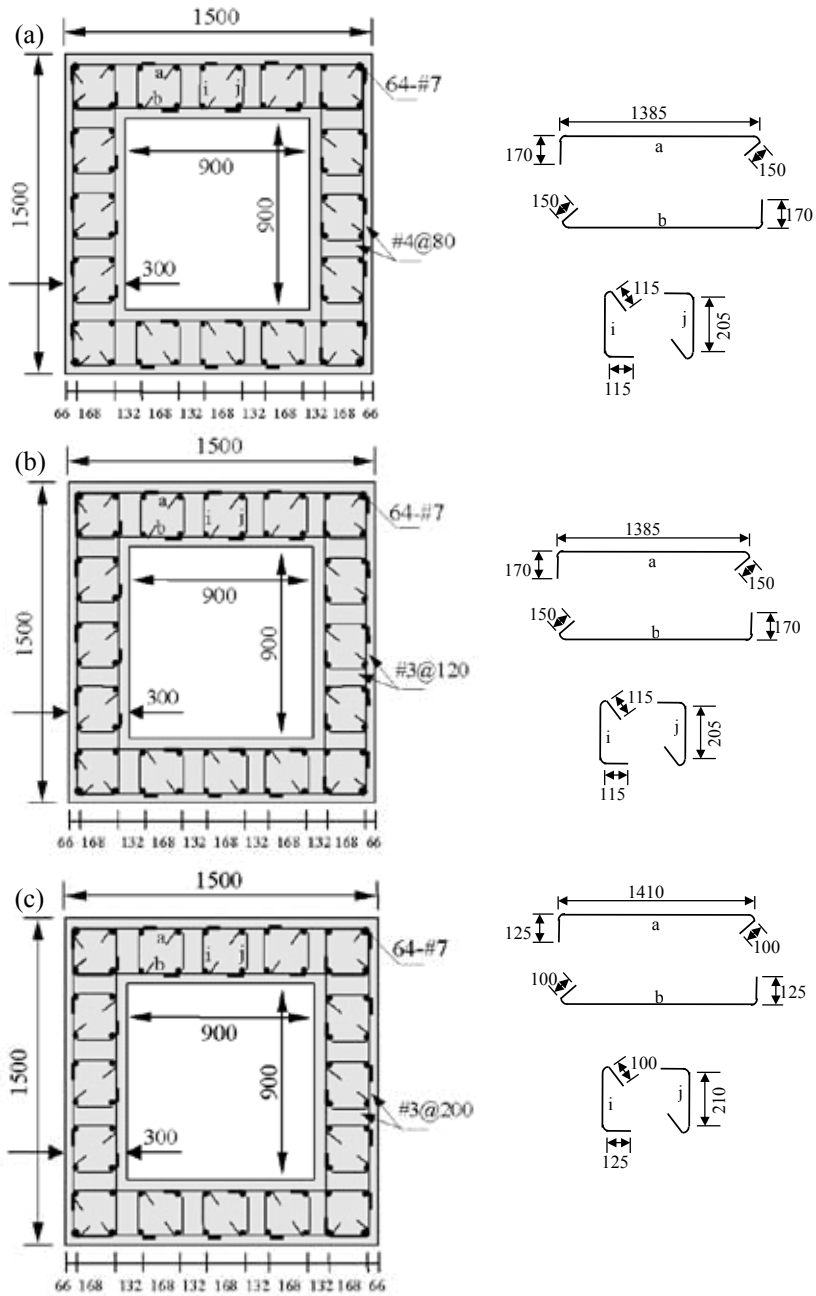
Dimensions (in mm) of cross sections and reinforcement details of specimens (a) PS1 (b) P11 and (c) P12 (Yeh and Mo, 1999).
